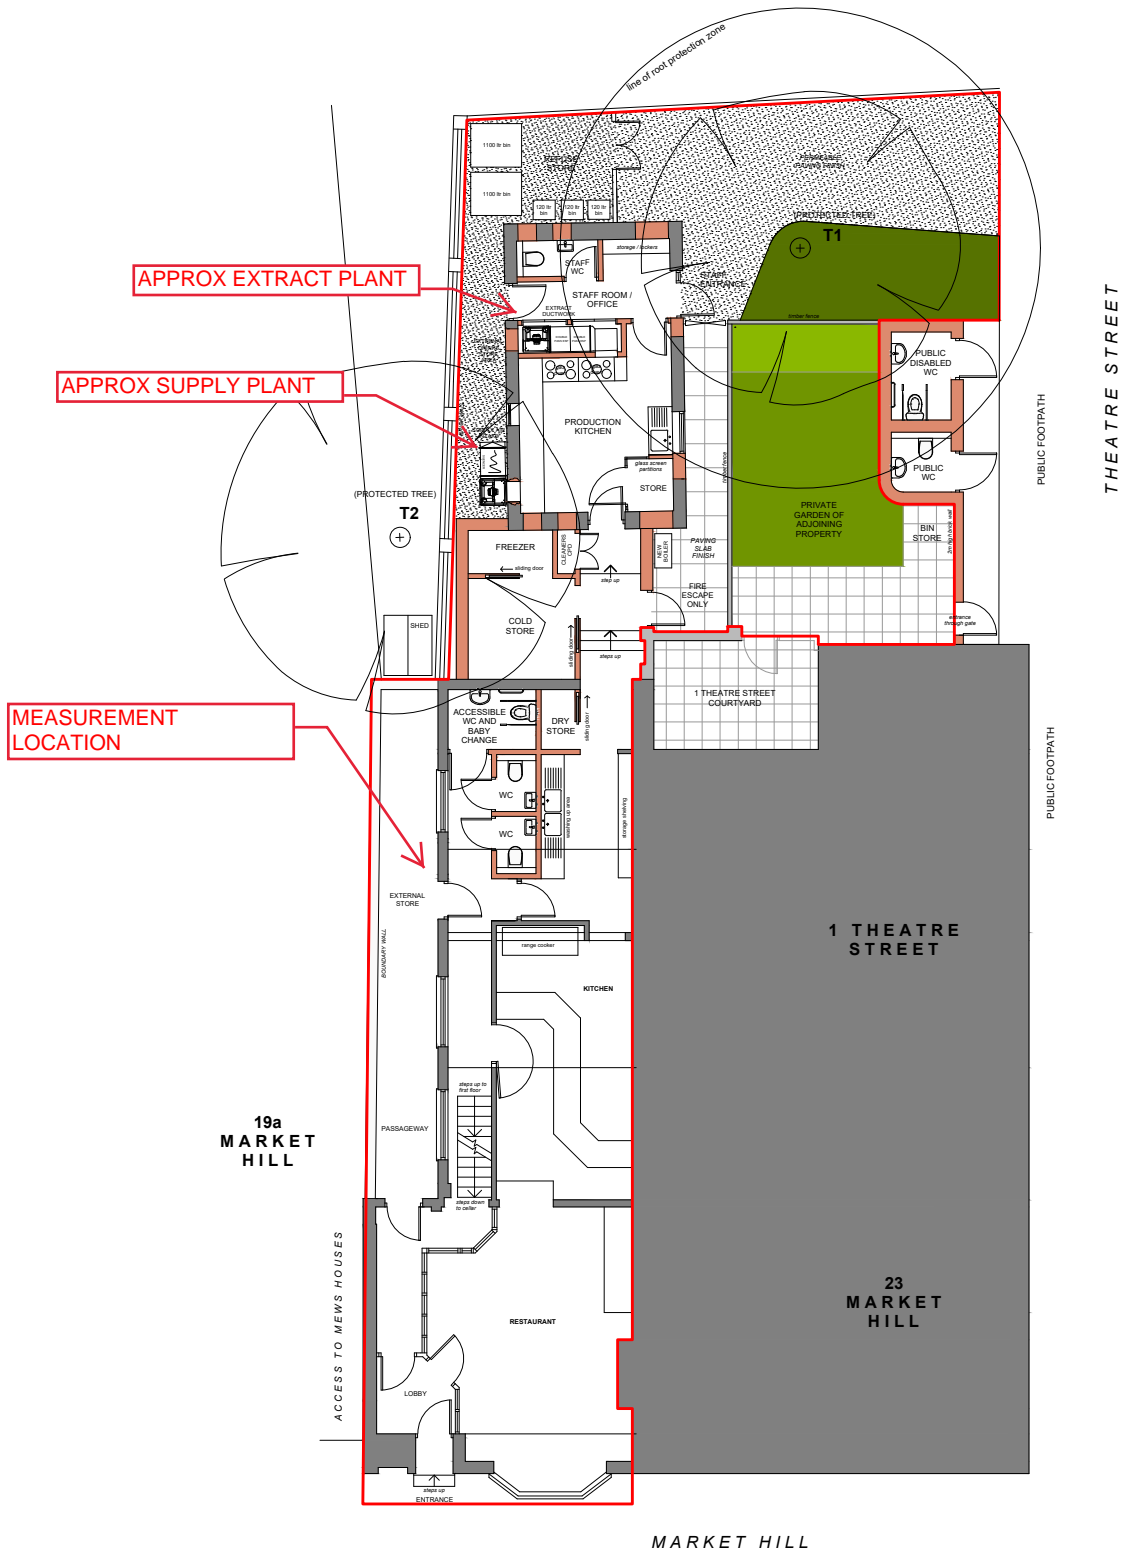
Proposed development site plan with proposed plant location and Measurement Position highlighted.
